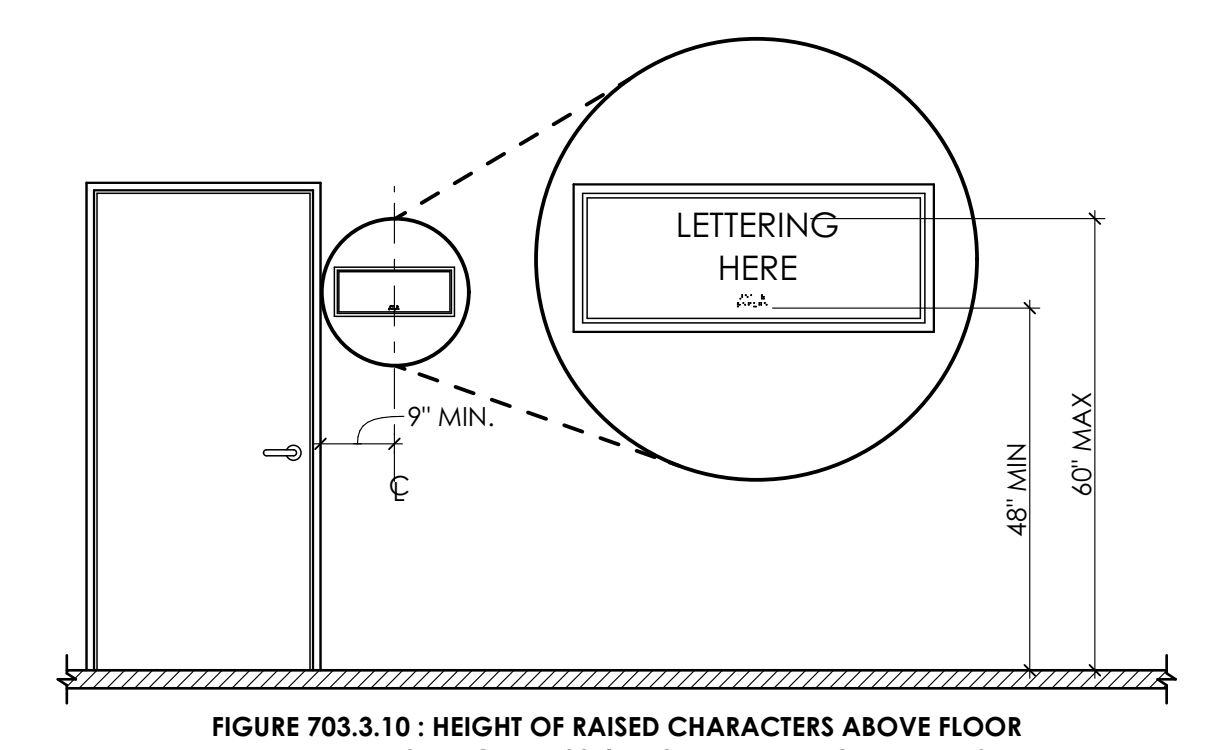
HEIGHT OF RAISED CHARACTERS ABOVE FLOOR
